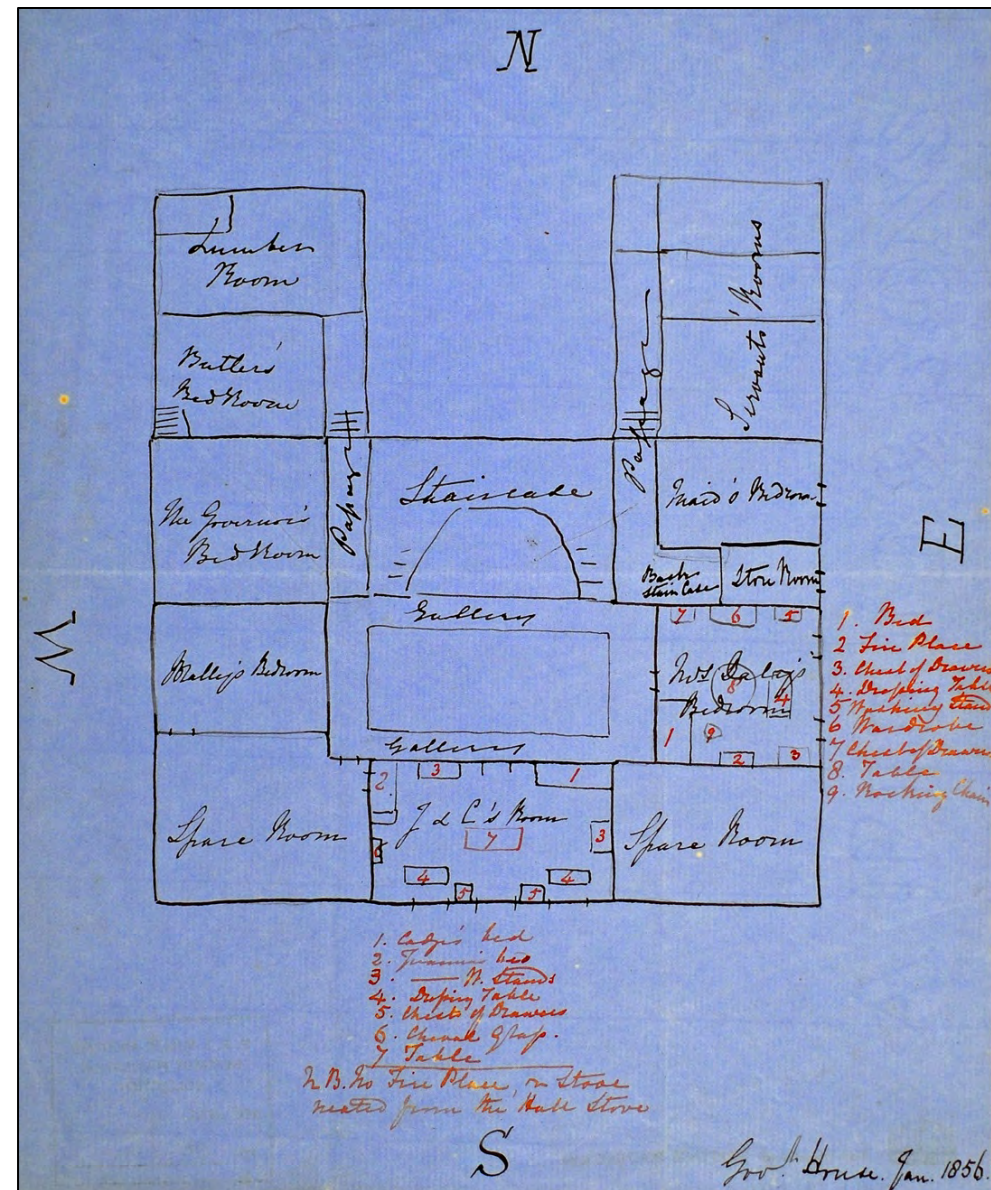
5: Architectural drawing of the floor plan of the Government House, dated to 1856.<sup>26</sup>
